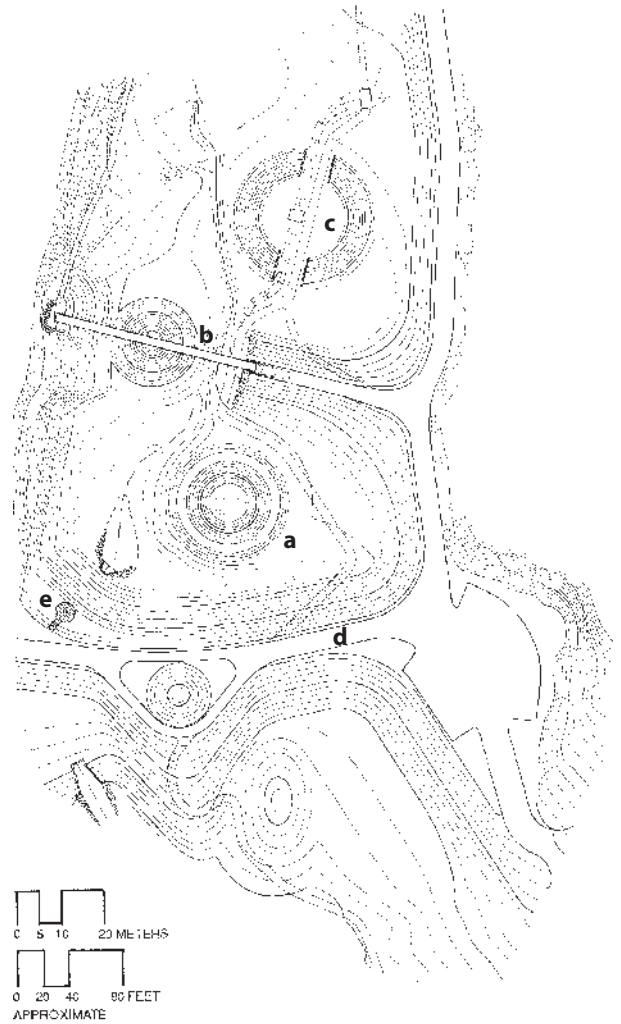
Site plan of Earthworks Park. (a) Circular pond. (b) Bridge structure. (c) Ring-shaped mound. (d) Embankment. (e) Spillway structure.
